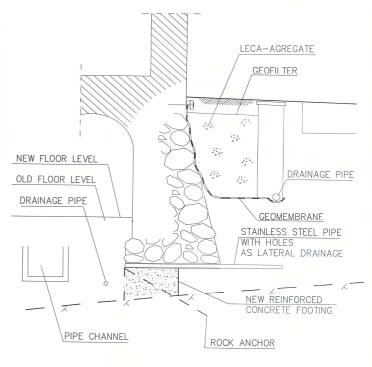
Southern wall. Soil pressure at rest minimized by using Lega-aggregate. Lateral drainage through wall. New footings and rock-anchors.
